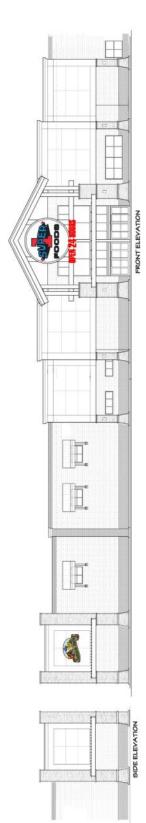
# EXHIBIT J - BUILDING SIGNS(CONTINUED)
